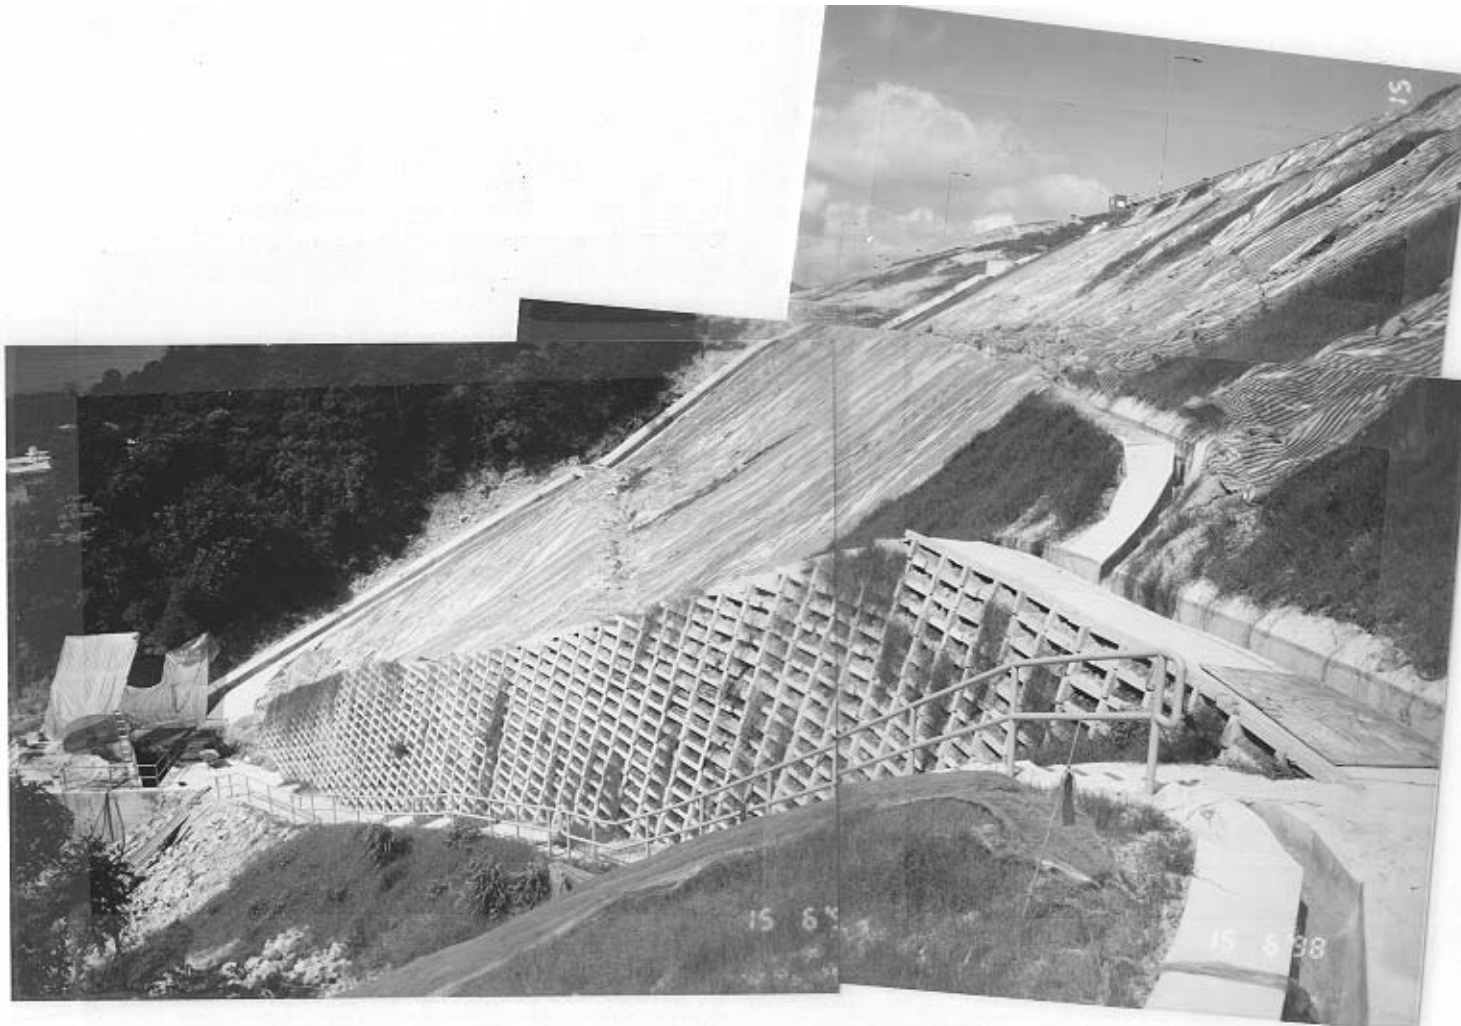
Event No. 3: 9 June 1998. View South-West Across Slope A. Note Extensive Coverage of Slope Face with Plastic Sheeting and only Minor Washout of Debris at Joins in Sheeting. Note Also Blocked Drainage on 58 mPD Berm in Centre of Frame. (Photograph Taken on 15 June 1998)
